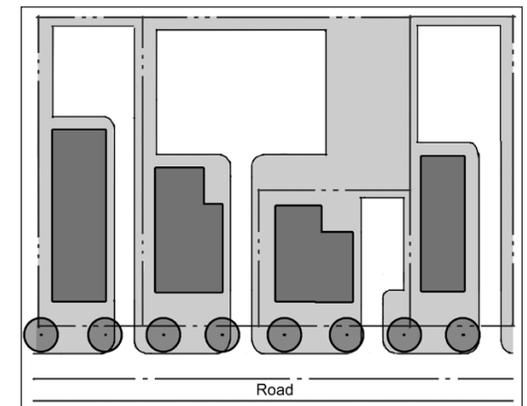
Similar building setbacks provides a cohesive frontage along the main road.
